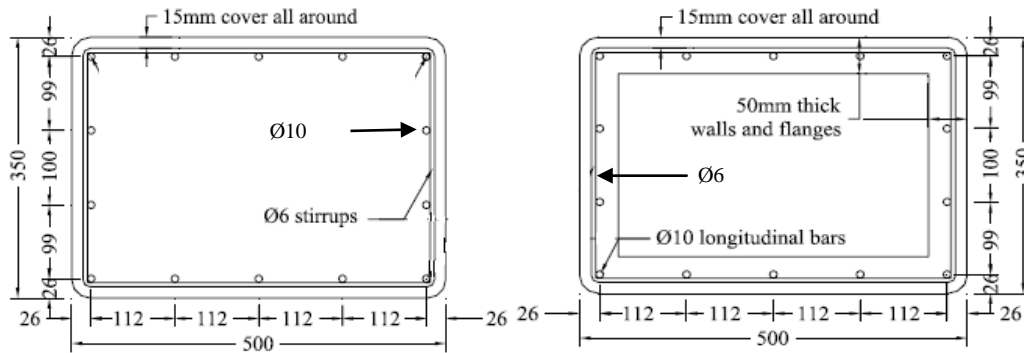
Reinforcement Layout of Solid and Box-Section Beams [Hii and Al-Mahaidi 2006]
